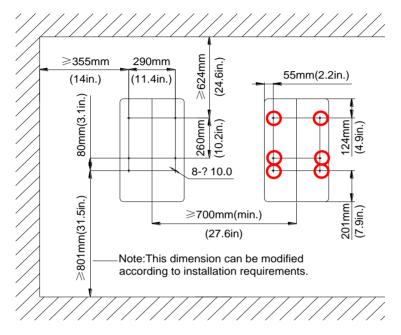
Dimensions of the bracket anchoring holes for mounting
